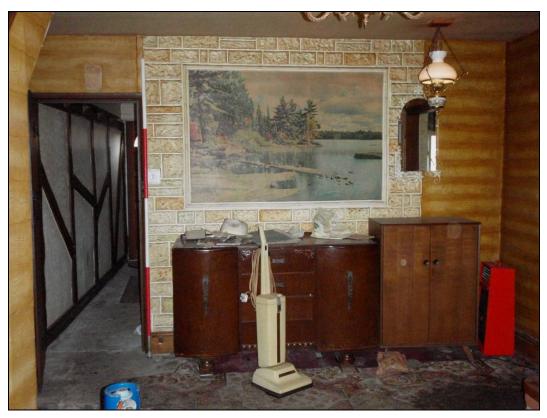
View of the partition wall between the Sitting Room and the Parlour
